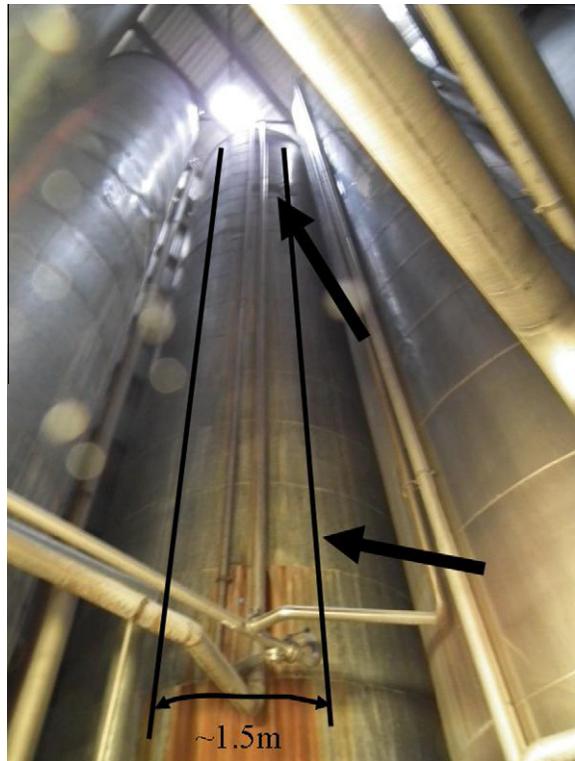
Outside view of the tank with the corroded zone inside the tank marked.
